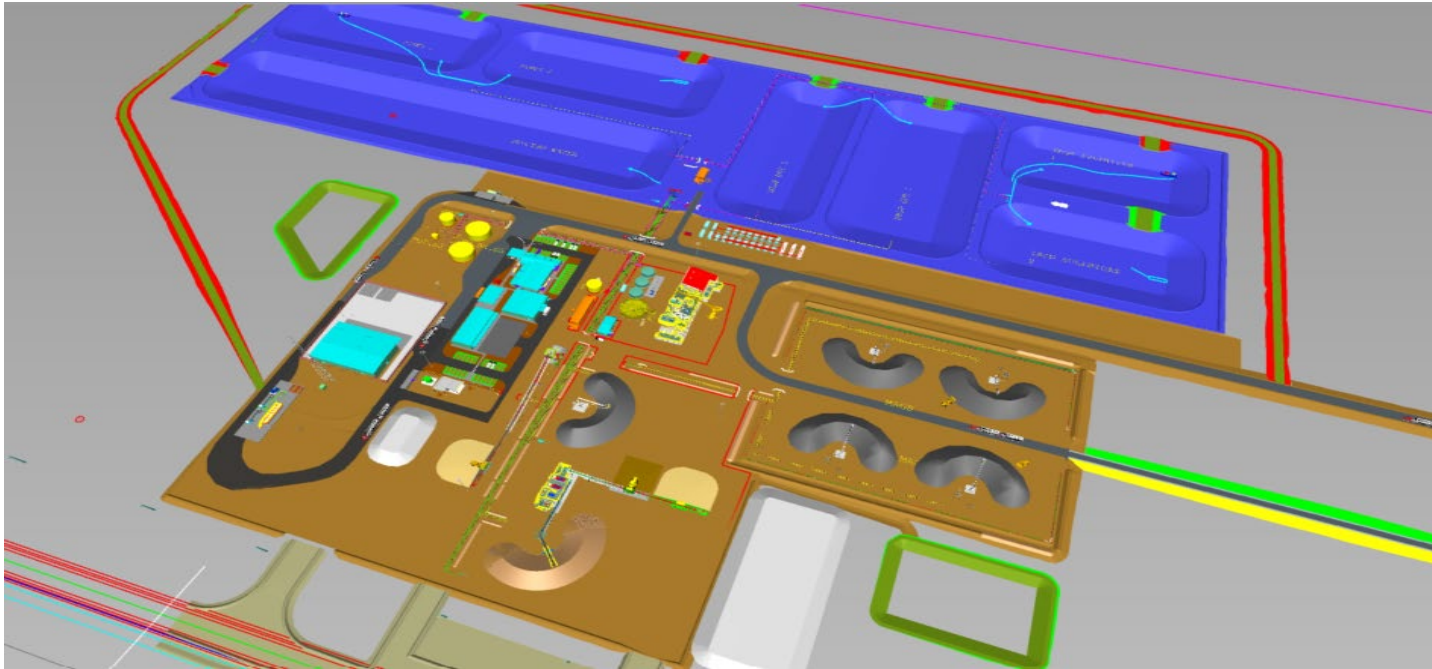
Conceptual three-dimensional view (looking from the west) of the ore processing plant and water infrastructure. The layout will be optimised prior to construction.
